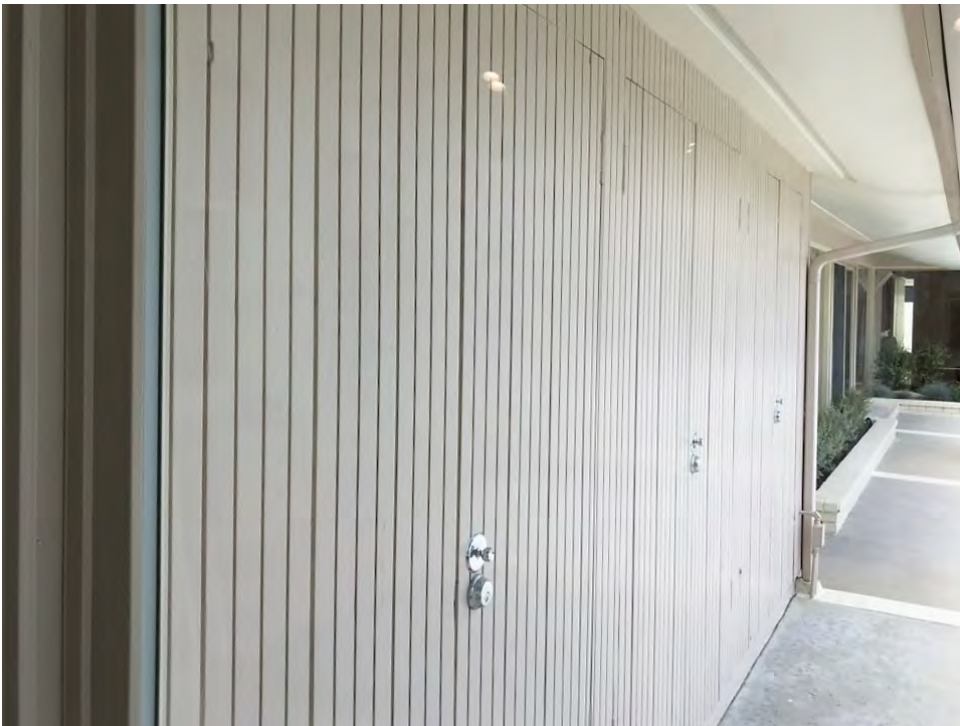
Hidden storage at east elevation. View: NW. Daniel Paul.
